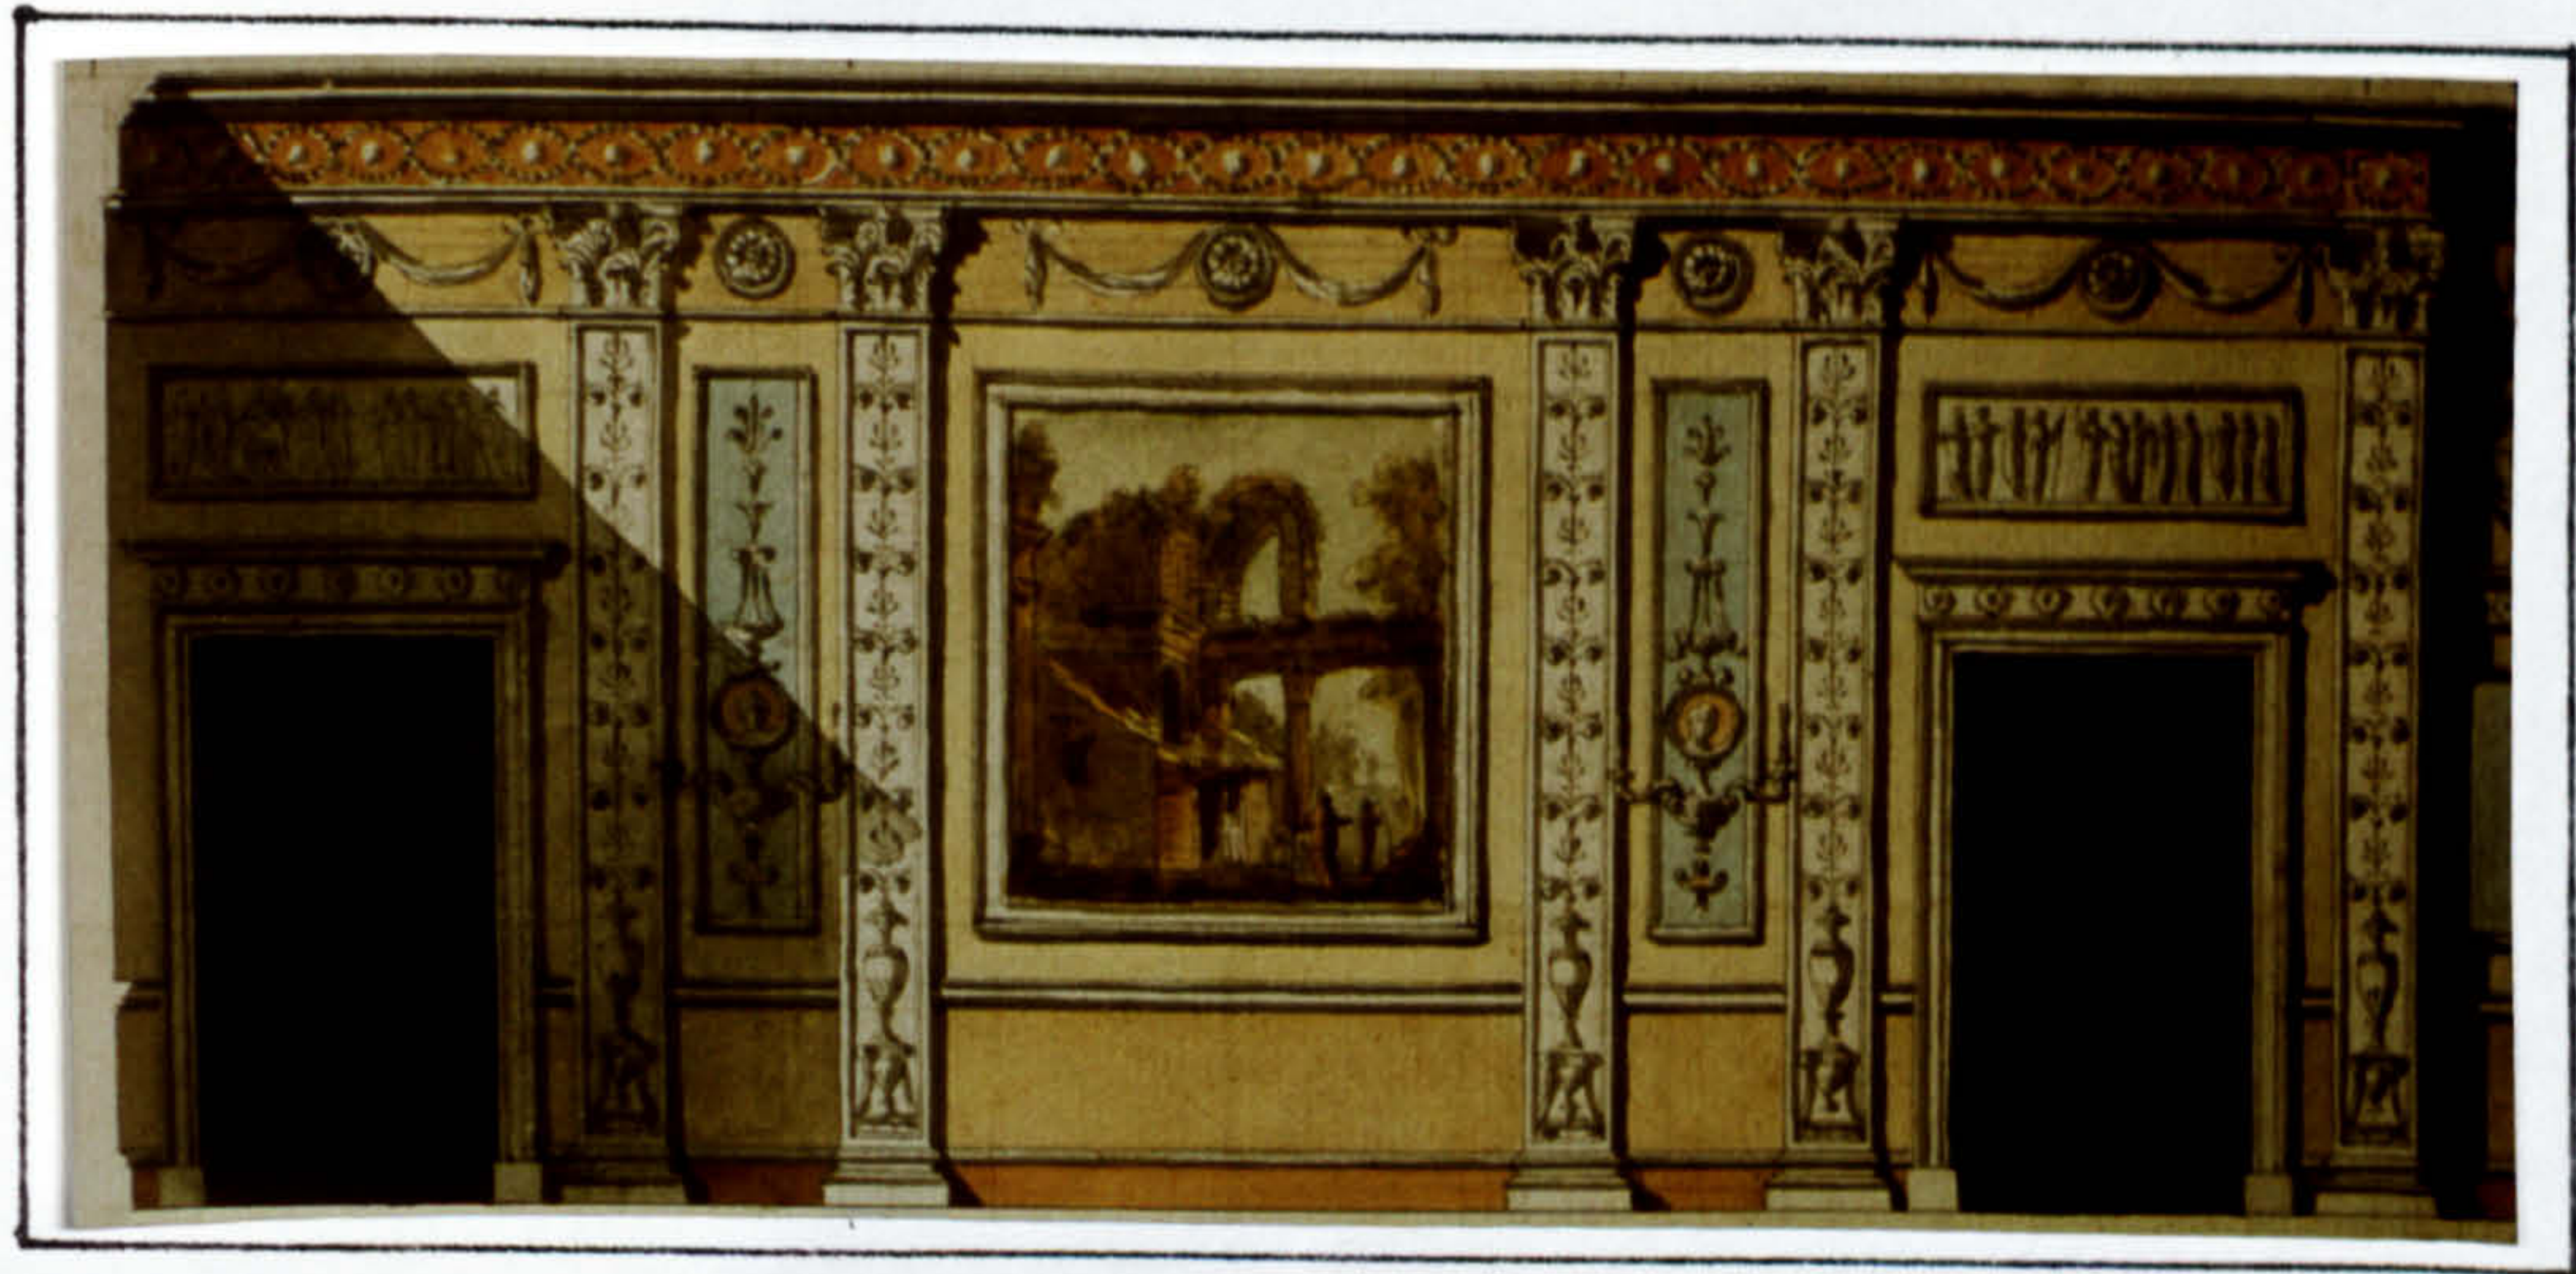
ROBERT ADAM · ELEVATION FOR BACK PARLOUR · HOME HOUSE
